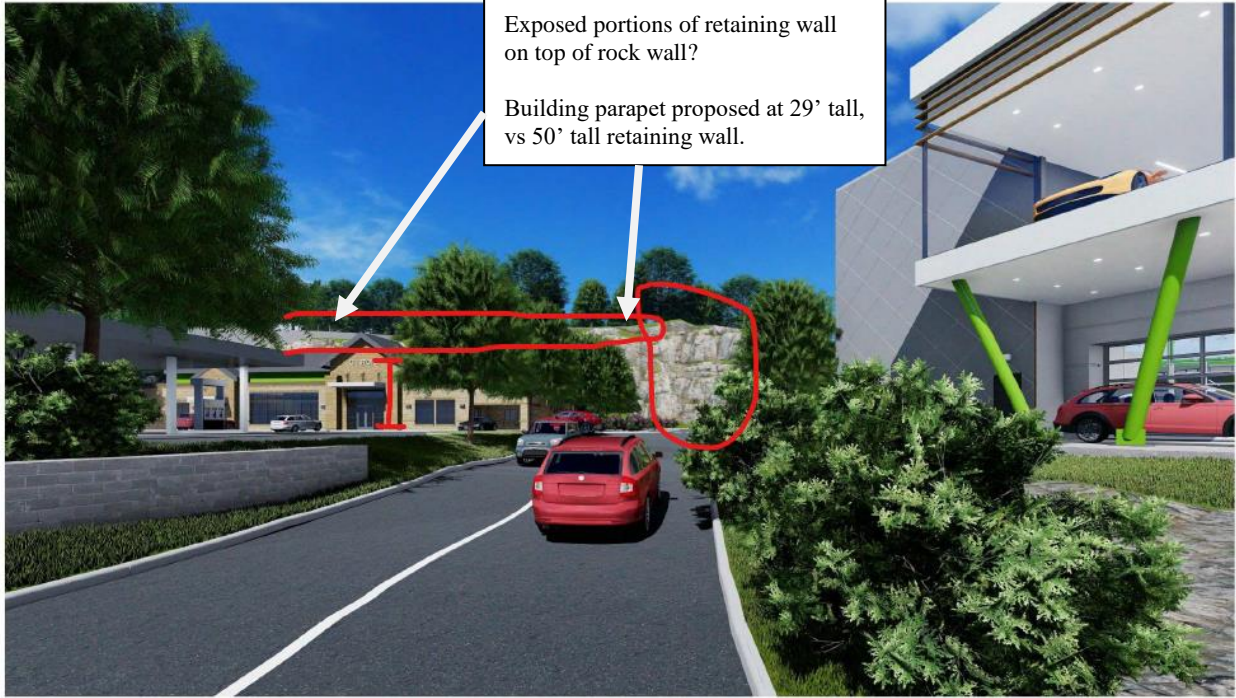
Indicates retaining wall runs where shown, retaining wall not shown in renderings through this area
